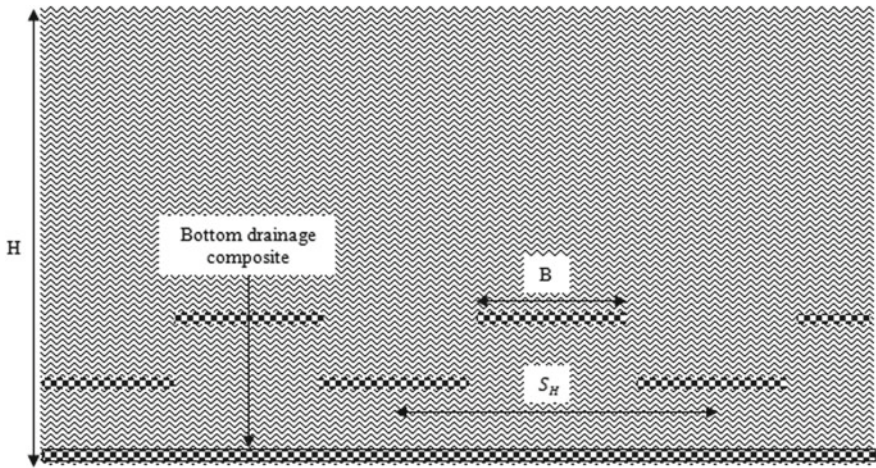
Arrangement of drainage composite in water retaining embankment along section AA
